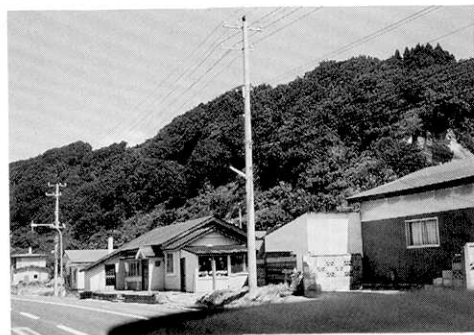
House of Mr. S. Horii's at Hirahama in Taisei Town. Notice that the front block wall was damaged by the tsunami.
